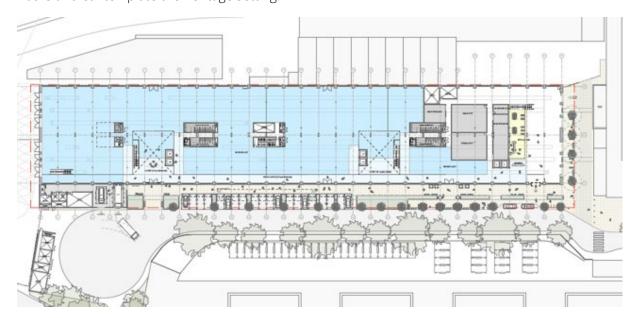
Proposed ground floor plan indicating the potential zone for retail in yellow. Reference scheme only for the Rezoning Application. Design is subject to detailed design, SSDA and planning approvals. Source: FJMT, 2022.
